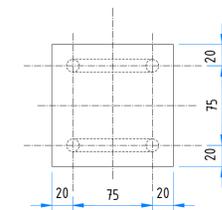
DETAIL-X (NOTE:- EXPANSION JOINT EVERY 4.8m.)
